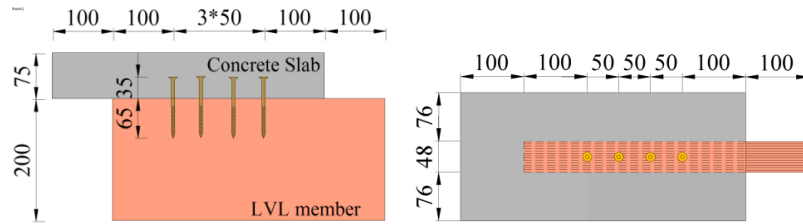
4WS spaced at 50mm specimen: (a) cross-section, (b) plan view (in mm)
